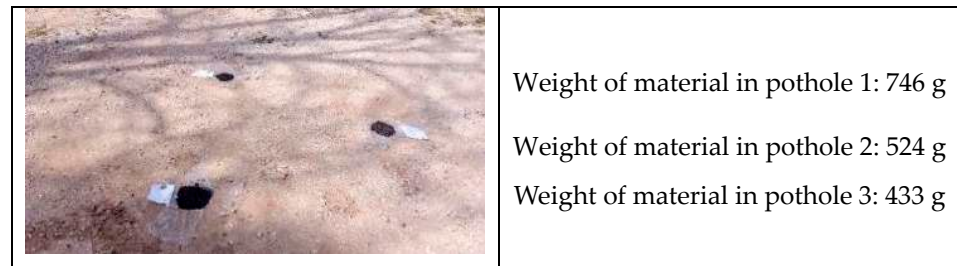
Test at the parking lot of FCIE: plan for the potholes.
